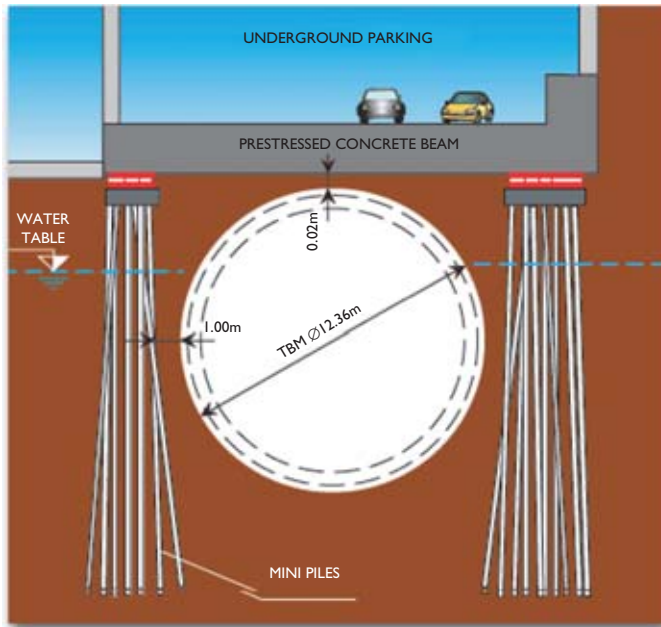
The Zimmerberg Tunnel in Zurich – Reinforcement through underpinning of an underground car park underpassed by the TBM excavation (Kovari et al., 2004).
